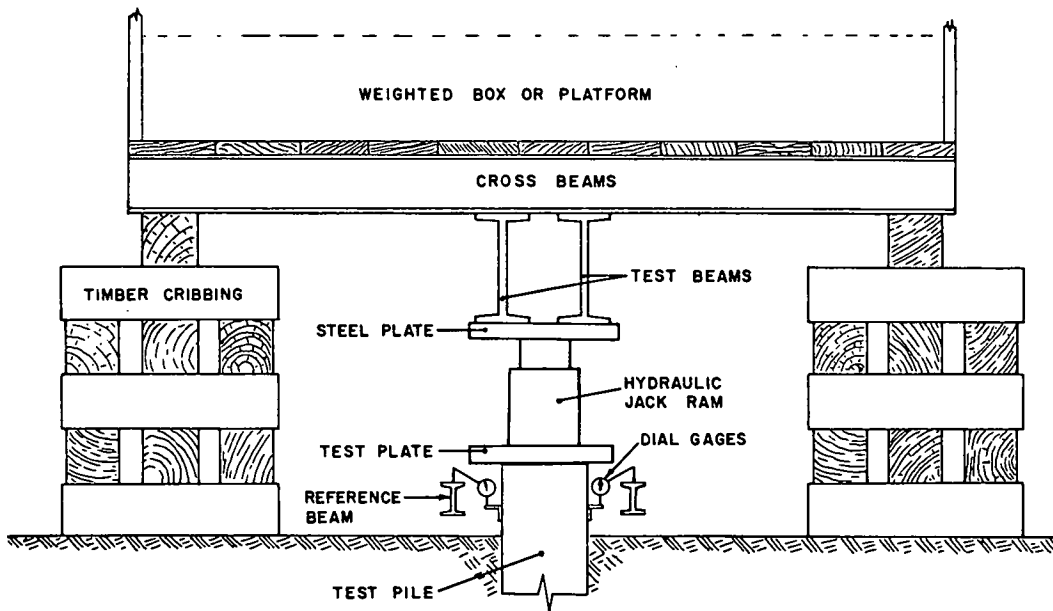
Typical setup for pile load testing in axial compression using a loading platform (214).
